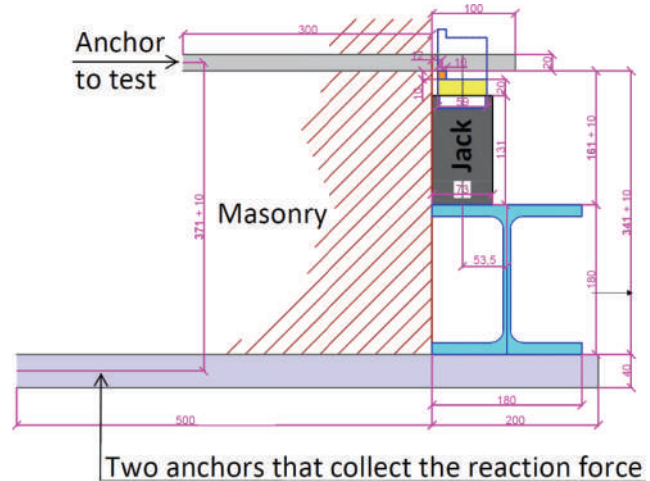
Shear strength test set-up applied to the anchor having $\Omega = 20$ mm and $L - e = 300$ mm: Transverse section of the masonry wall and longitudinal section of the tested anchor. The jack (a cylinder with a head) applies the force to the bottom of the anchor through a steel element of square section, which reduces the eccentricity of the force. The figure also shows the I-section steel beam that collects the reaction force of the jack, which is supported by two anchors of large diameter and long embedded length.
